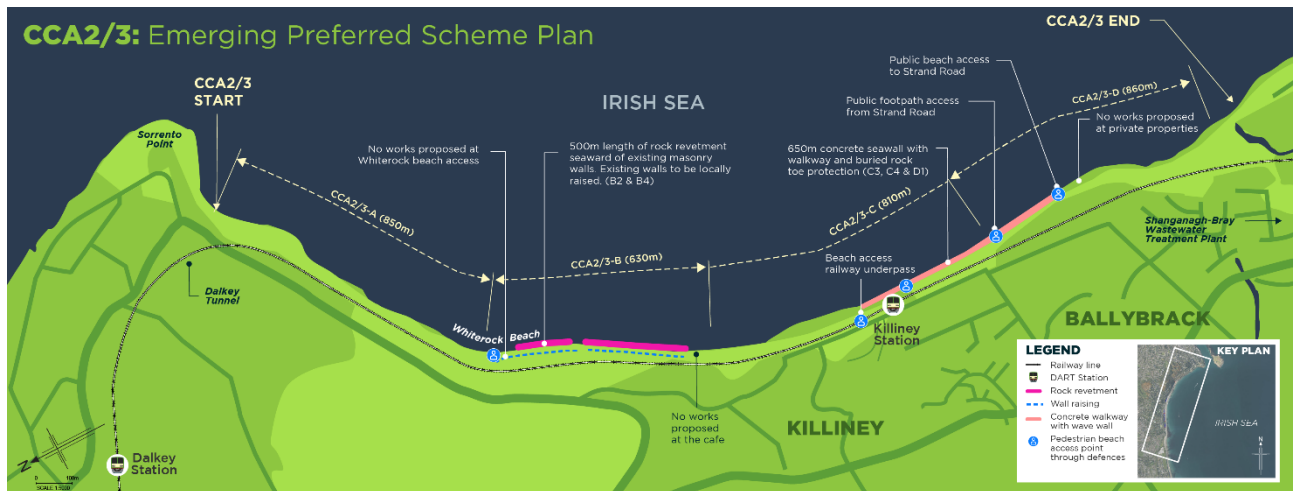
CCA2/3 Emerging Preferred Scheme Plan
